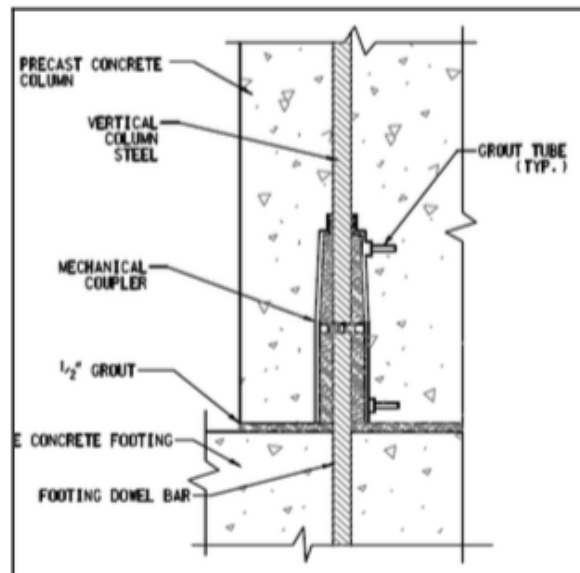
Column/Footing Grout Splice Coupler*. (Hewes, 2013)
